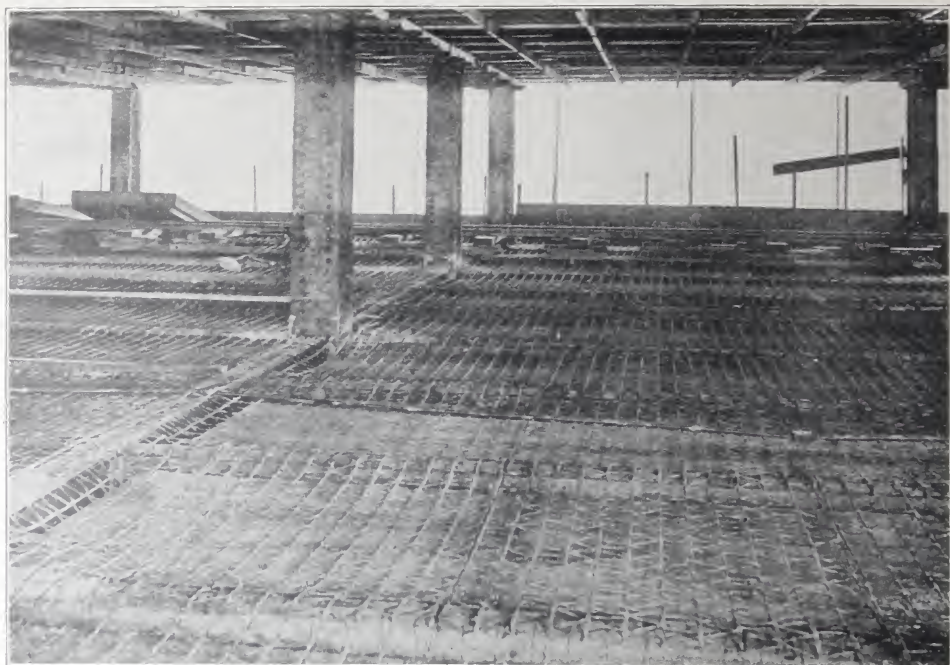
Seattle Warehouse, Triangle Mesh Fabric used for the Floors, Walls, Foundations and for Fire-proofing of the Steel Framing.
